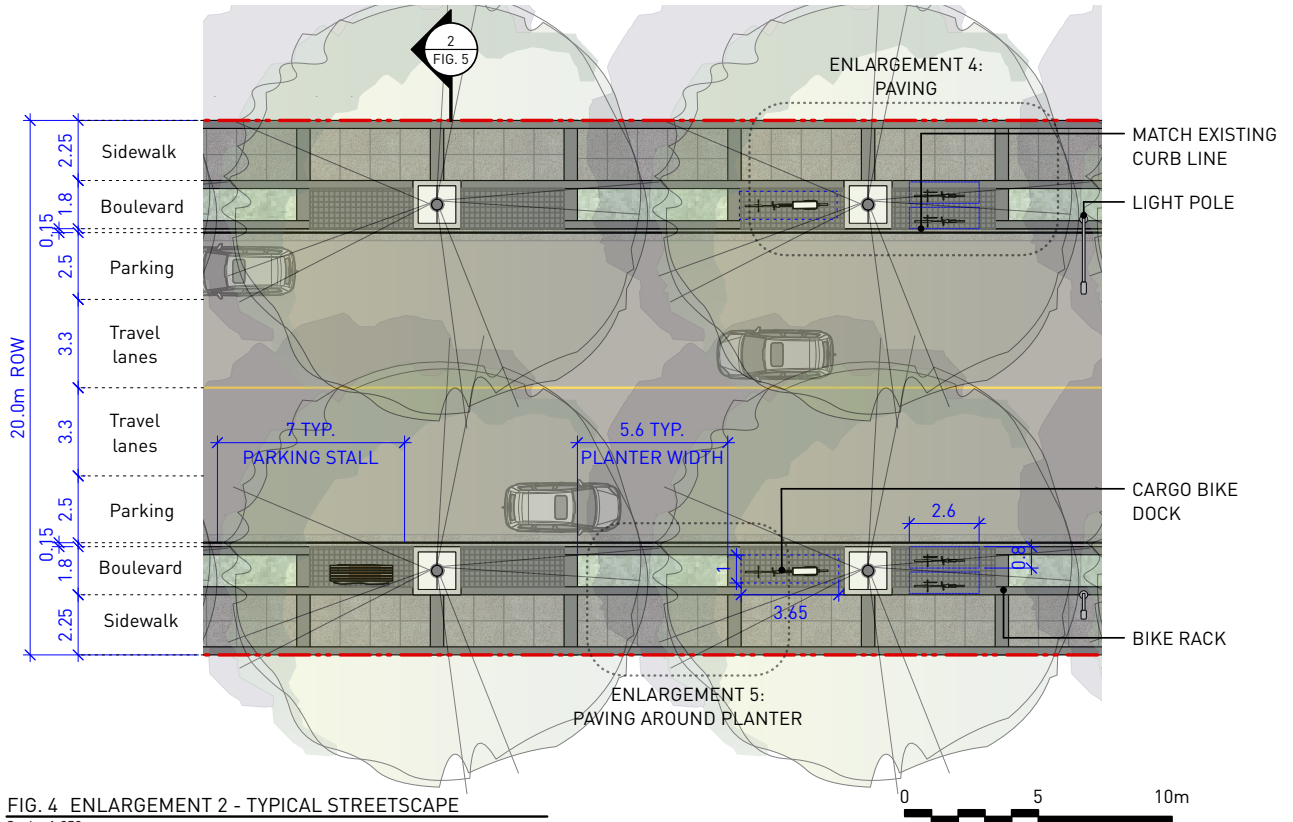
ENLARGEMENT 2 - TYPICAL STREETSCAPE
